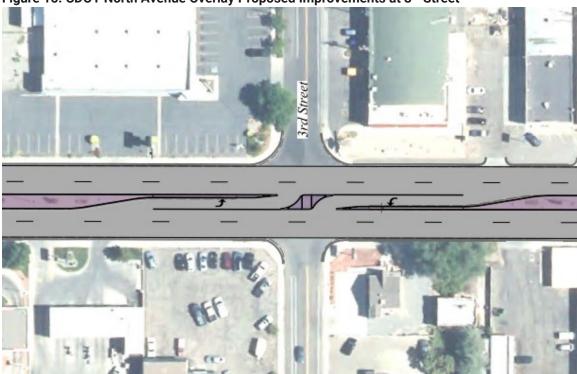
CDOT North Avenue Overlay Proposed Improvements at 3<sup>rd</sup> Street
